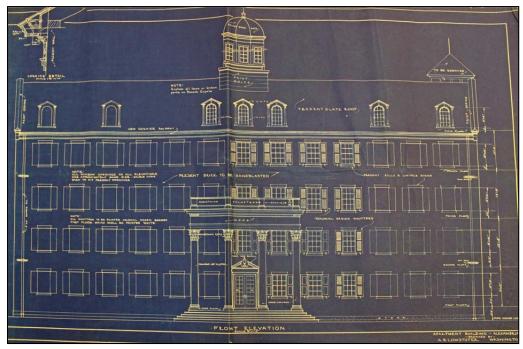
1935 A.B. Lowstuter's Design for Belle Haven Apartments. West Façade. Courtesy of Alexandria Local History Special Collections. Drawing notes the installation of the portico with Corinthian columns, front door, shutters, dormer windows and the removal of the top of the elevator tower.
